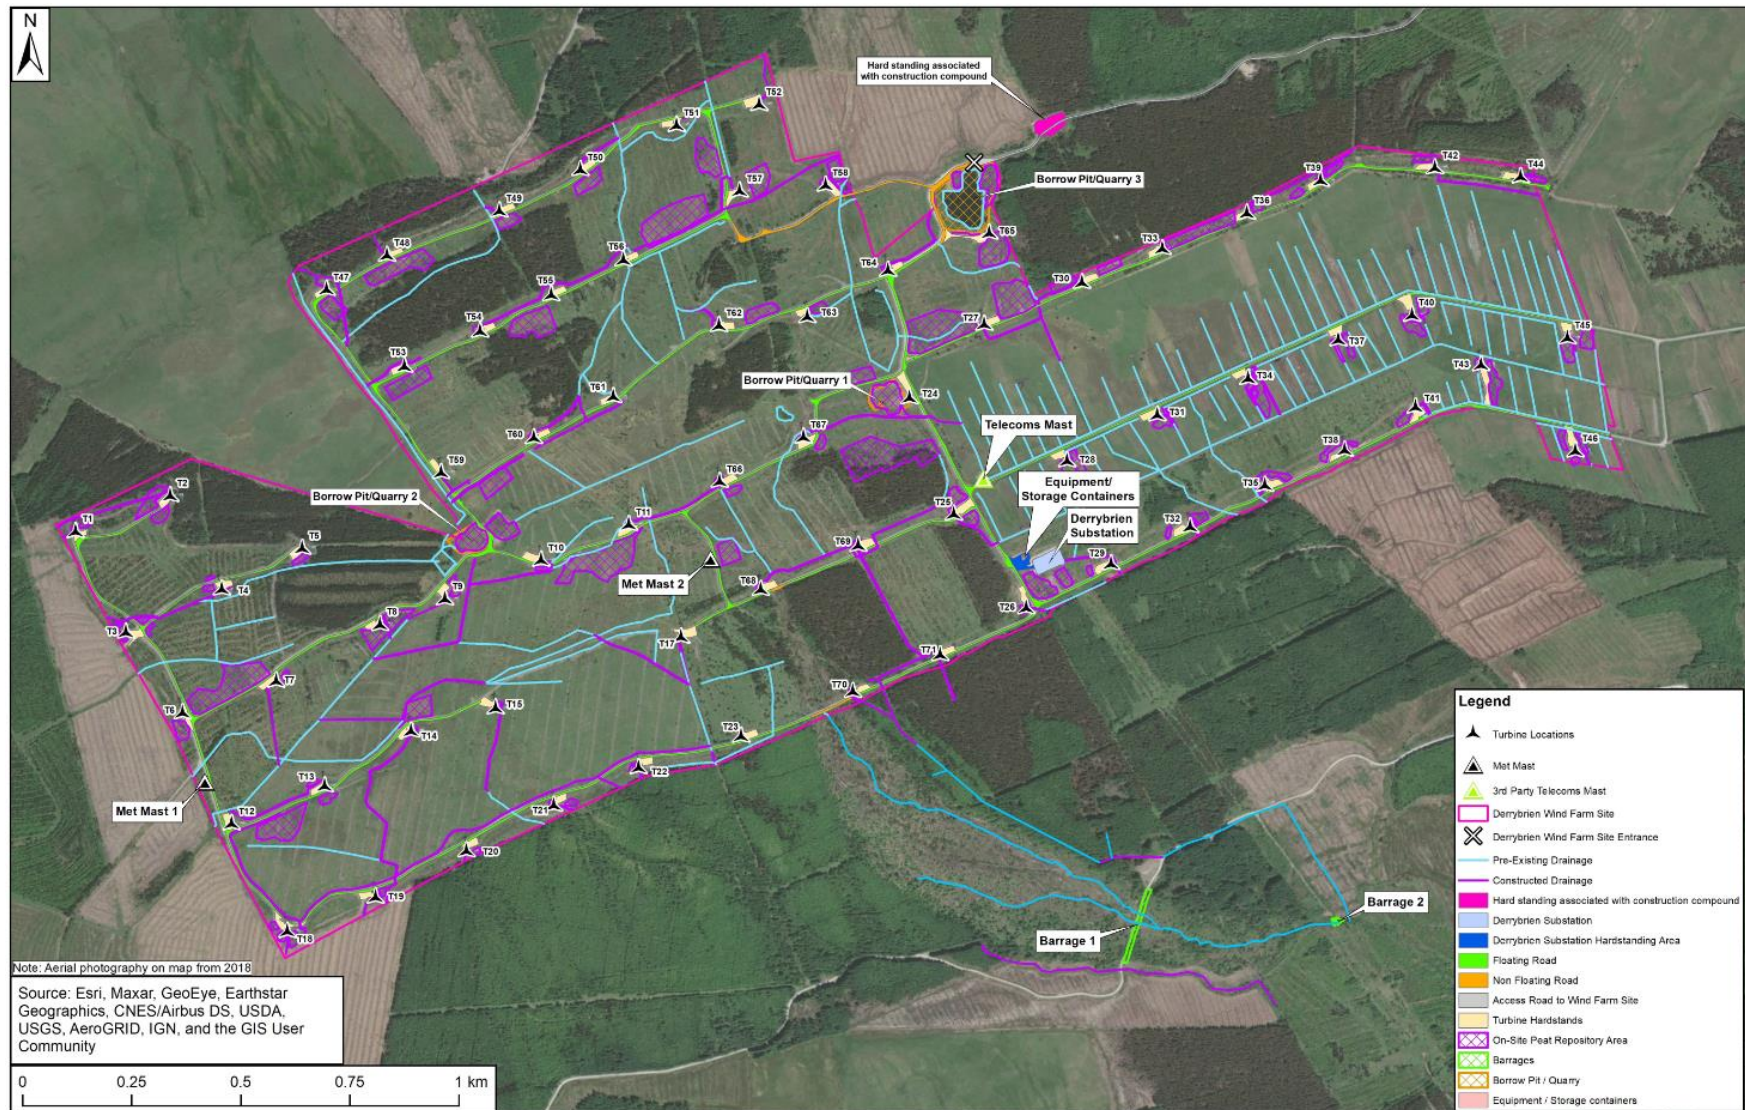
Layout of existing (pre-construction) and constructed drainage on the wind farm site
